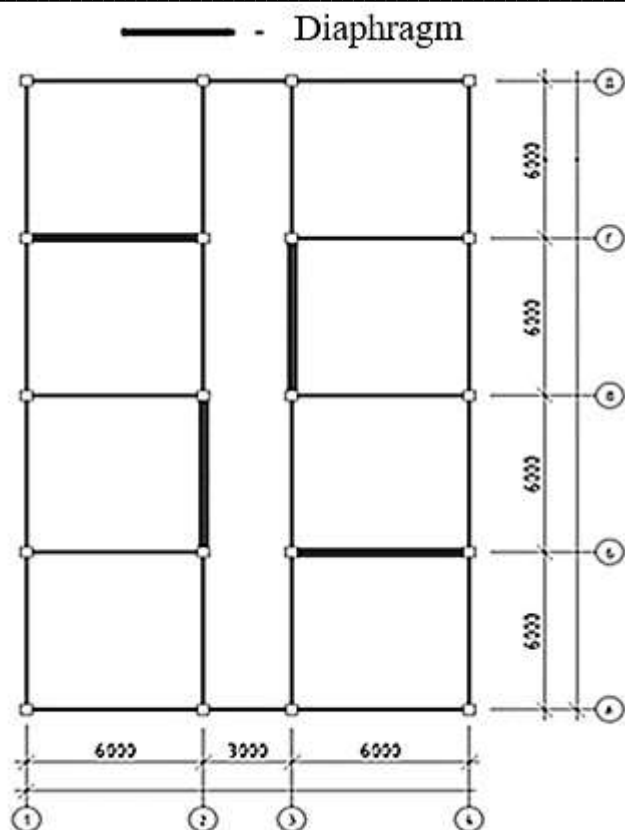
Layout diagram of the roof and diaphragms of the 9-story building.
